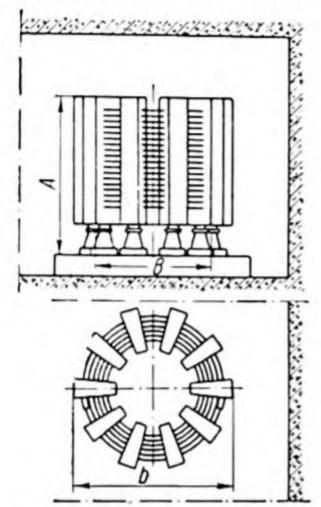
Installation dimensions of a cast-in-concrete reactor
